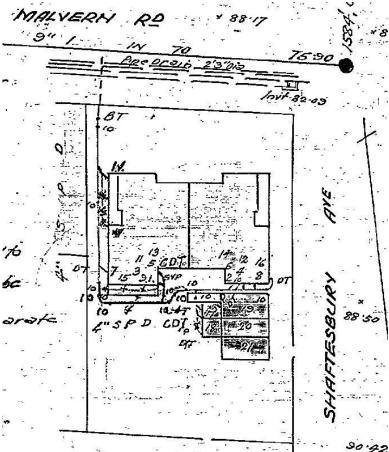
Property sewerage plan showing the layout of the building at 1298 Malvern Road, 1940 (Yarra Valley Water)
